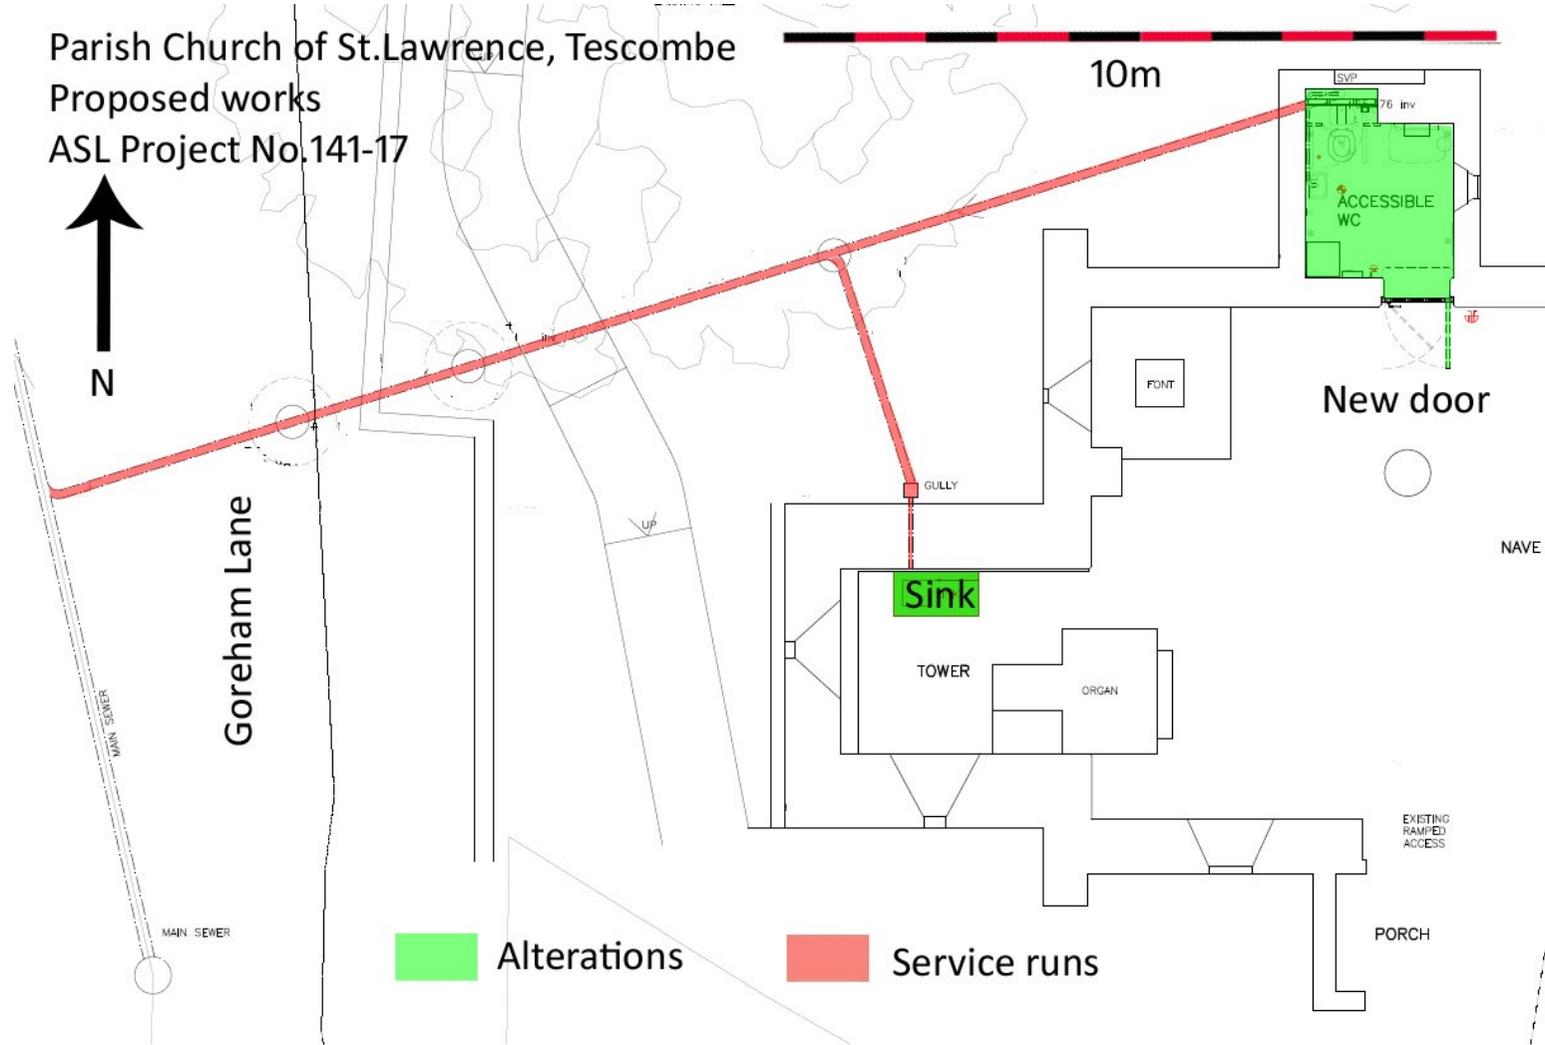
Proposed plans based on J.D.Clarke's plans drawing No.10301/02 (Rev.A).
